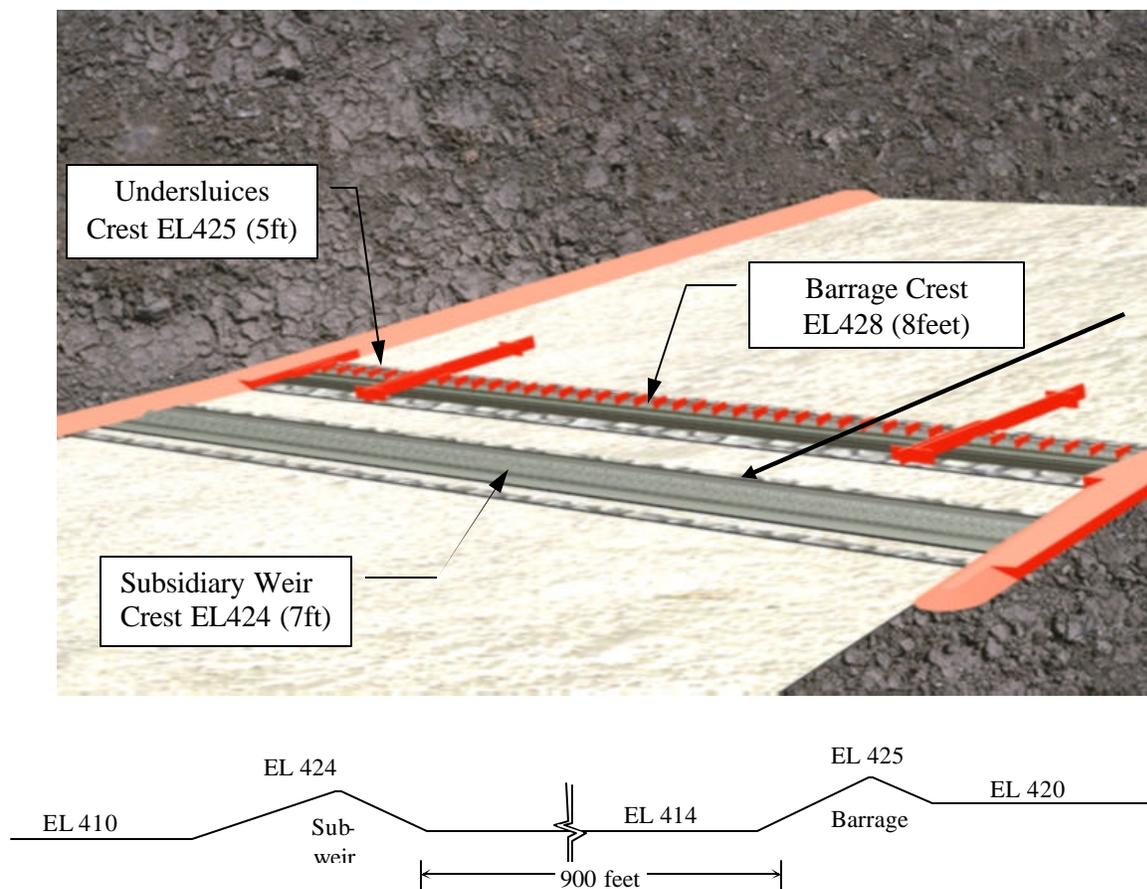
Taunsa barrage and the sub-weir plan and cross-section through undersluices.
